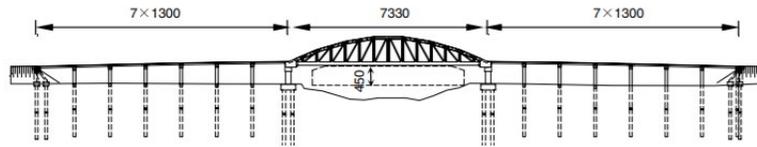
Elevation view of Qifeng Bridge (unit: cm)
